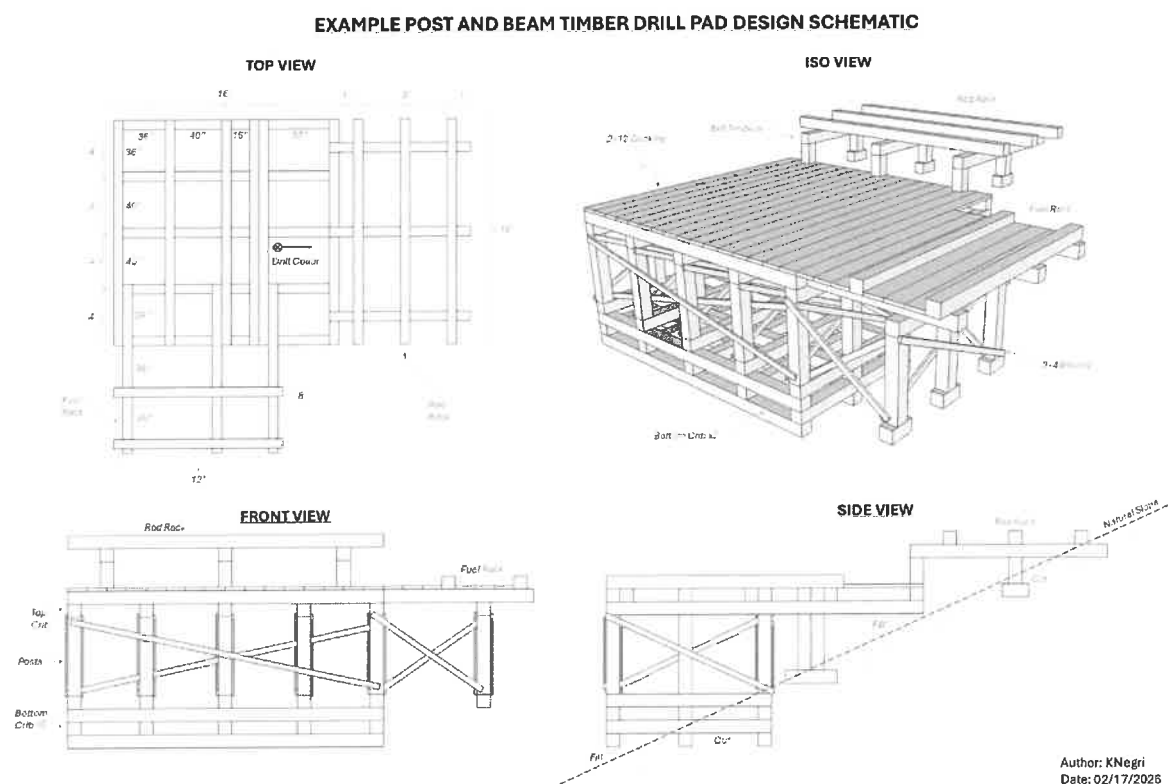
Example Schematic and Cross Section for a Typical Post and Beam Timber Drill Pad
